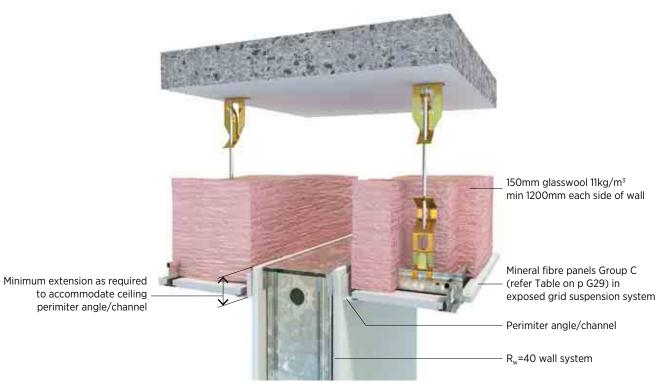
Ceiling configuration to maintain an  $R_w$ =40 wall acoustic rating (System OP.4 shown)
